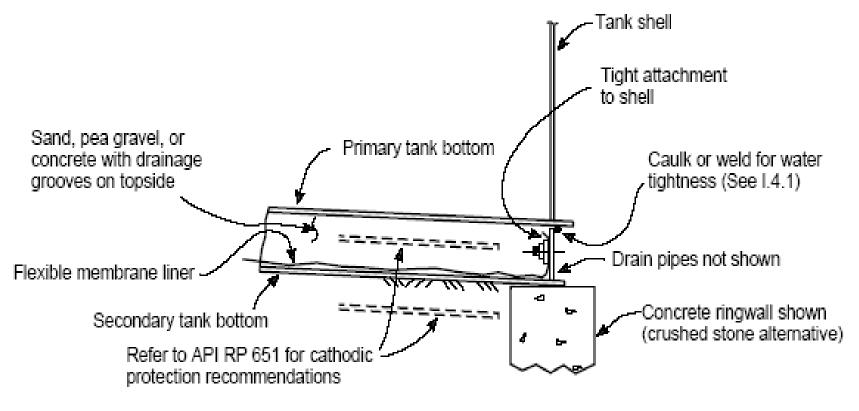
Double Steel Bottom with Leak Detection at the Tank Perimeter (Typical Arrangement)
